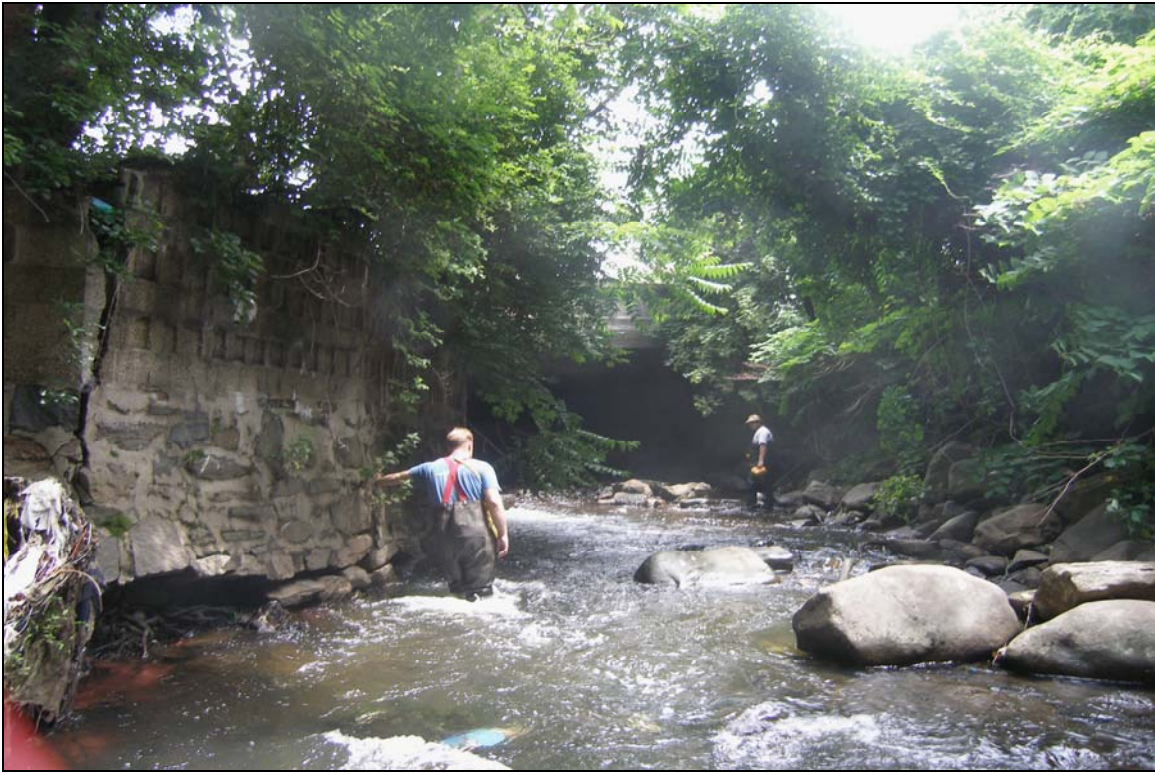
General view looking upstream from Sta 32+50 to the Henry Herz Street Bridge.
